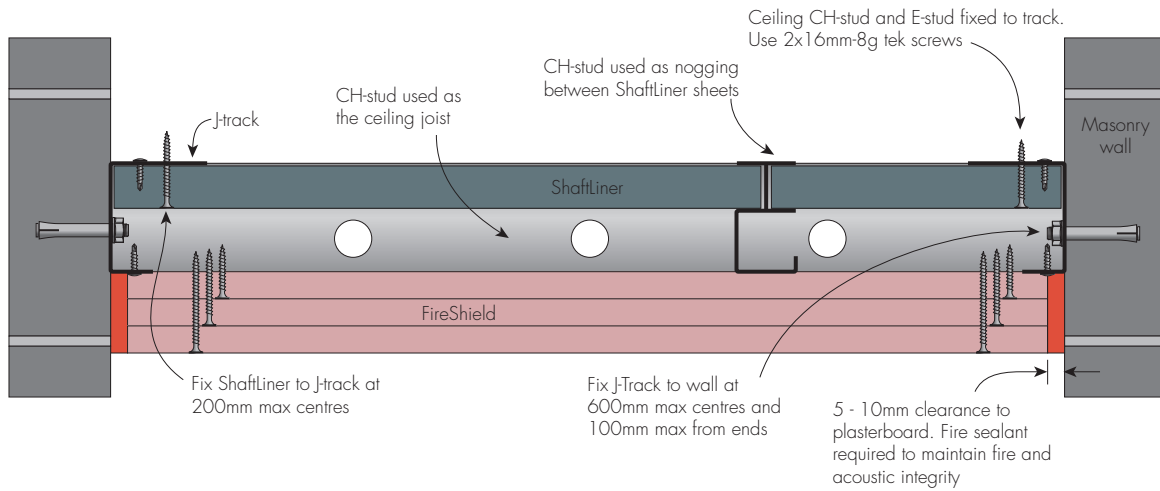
Horizontal Shaft Wall Non-Trafficable Ceiling to Masonry Wall
